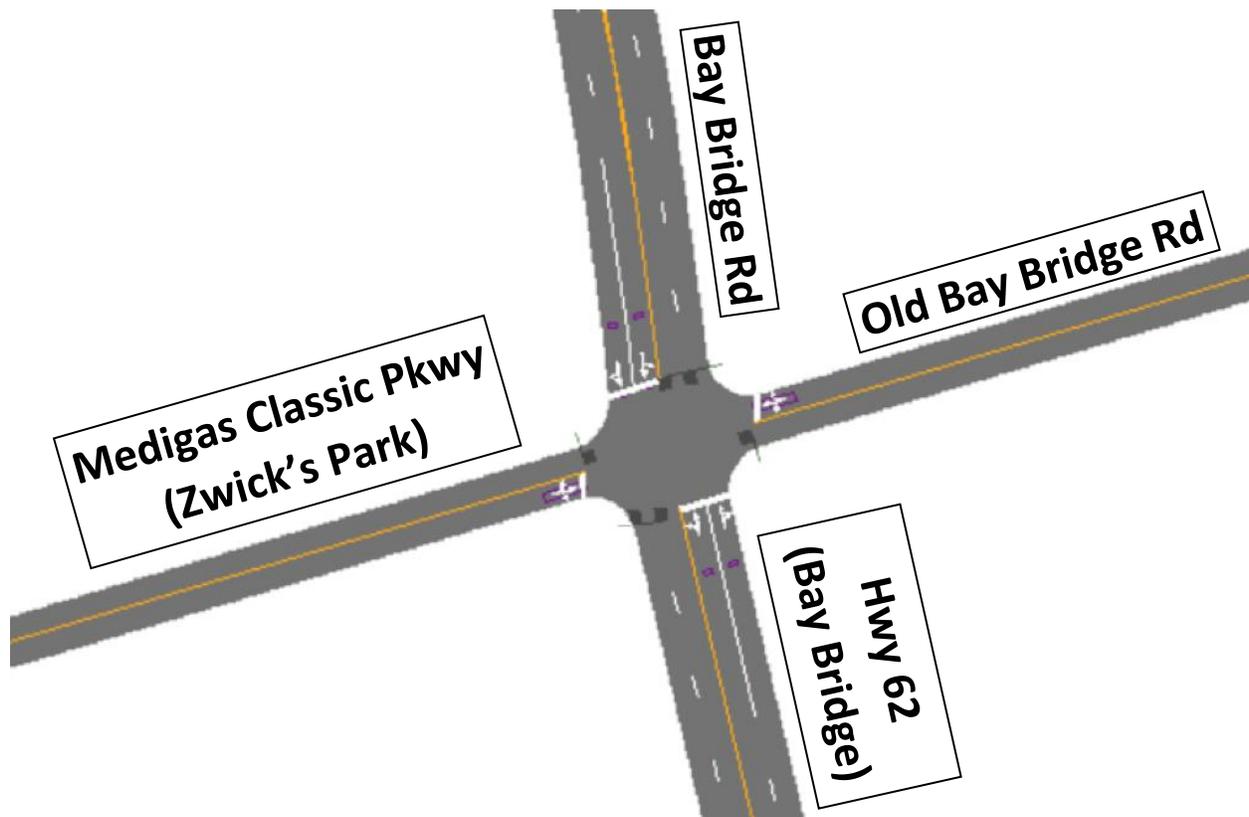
Intersection Configuration – Bay Bridge Rd at MCP / Old BBR (Trafficware LLC – Synchro 11)
